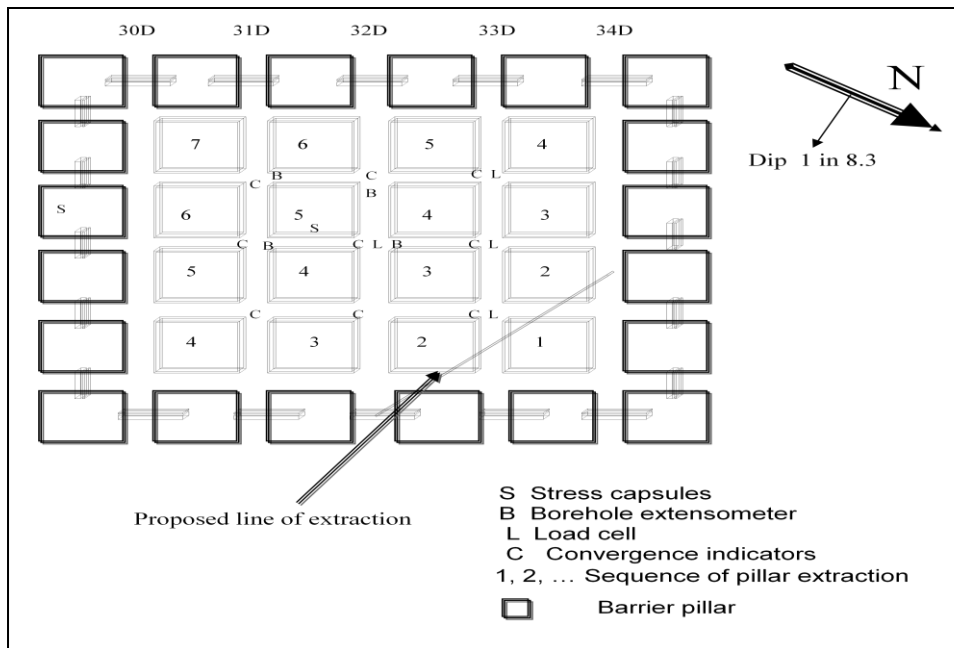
Working plan of a typical Blasting Gallery panel of an underground mine[1]
